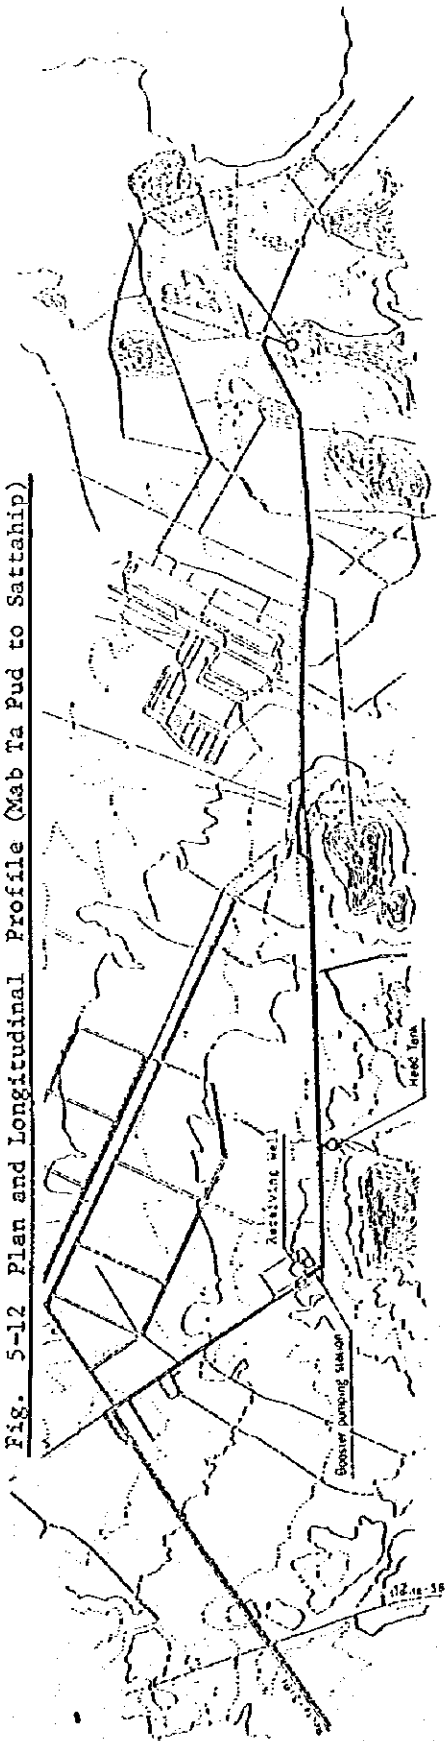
Plan and Longitudinal Profile (Mab Ta Pud to Sattaship)
